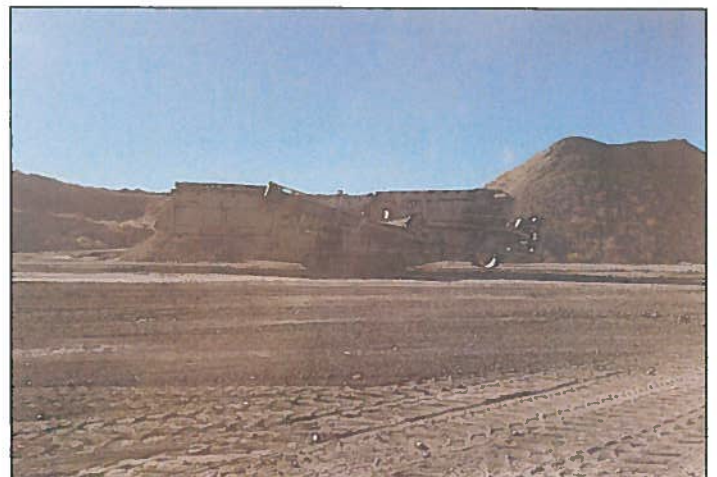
Portable crusher utilized for unapproved on-site recycling of concrete/asphalt.
